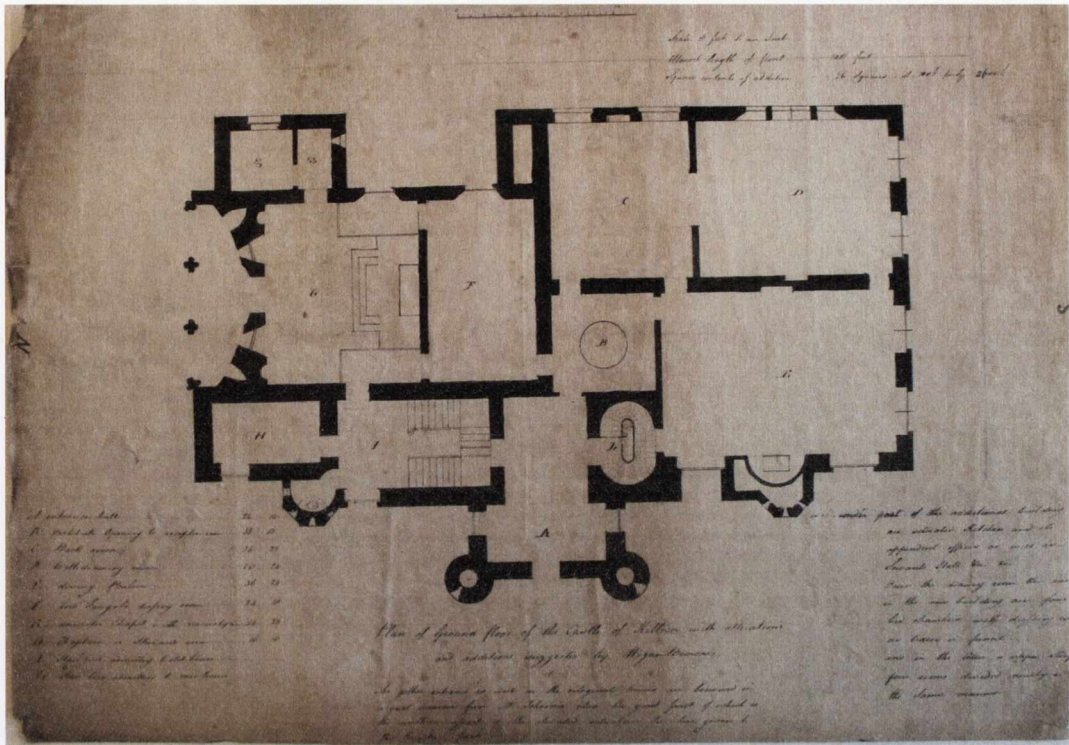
Killeen Castle, proposal, ground floor plan, Thomas Wogan Browne, [1802], IAA, RIAI Murray Collection, 92/46.901, courtesy of the Irish Architectural Archive.
